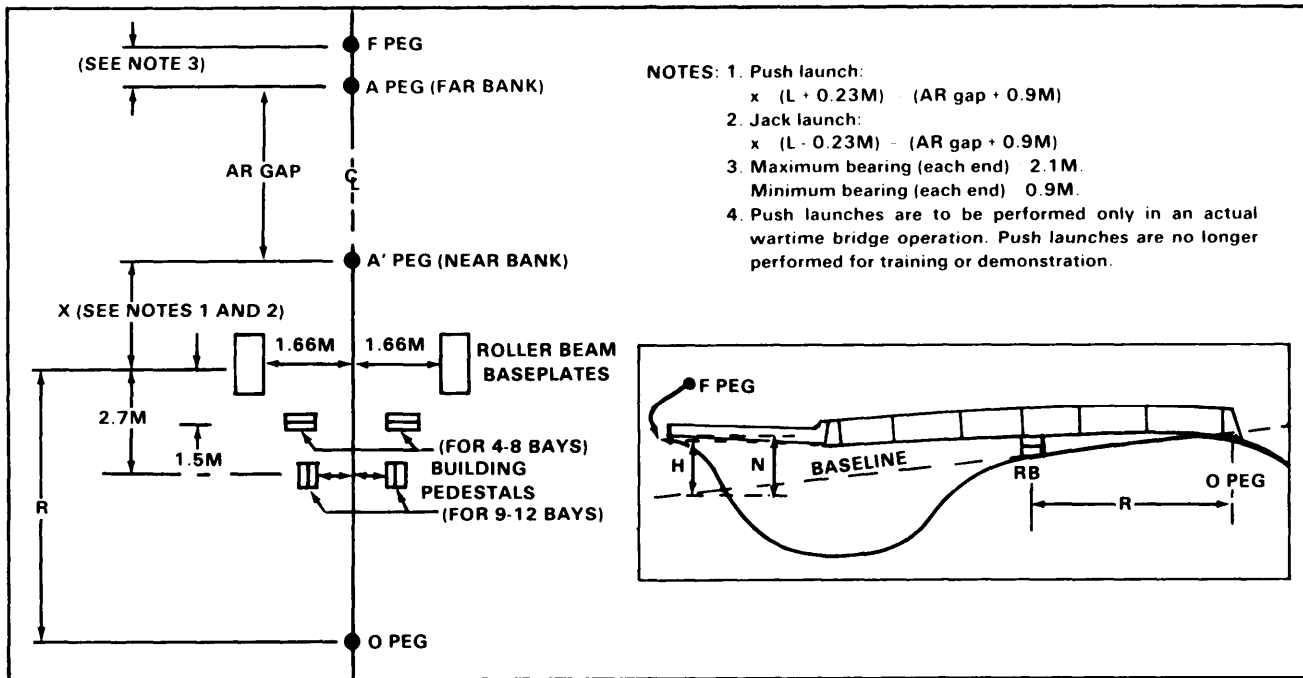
Single story MGB site layout (4 through 12 bays)
